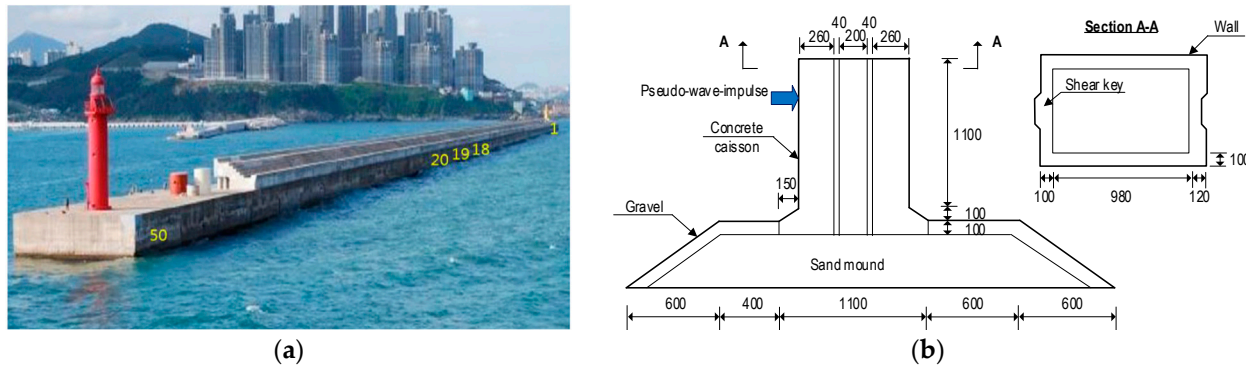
Parameters of the caisson breakwater system: (a) Oryuk-do caisson breakwater system [19]; (b) lab-scale caisson-foundation model [13].
